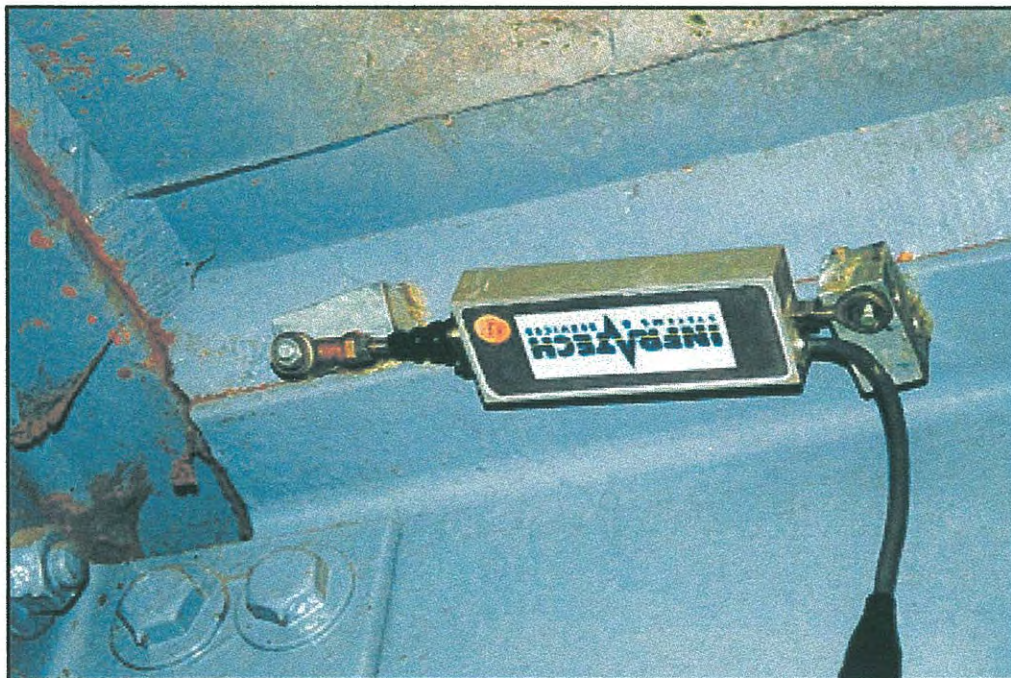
Demountable strain gauge installed to record the slip between steel stringer and concrete deck.
